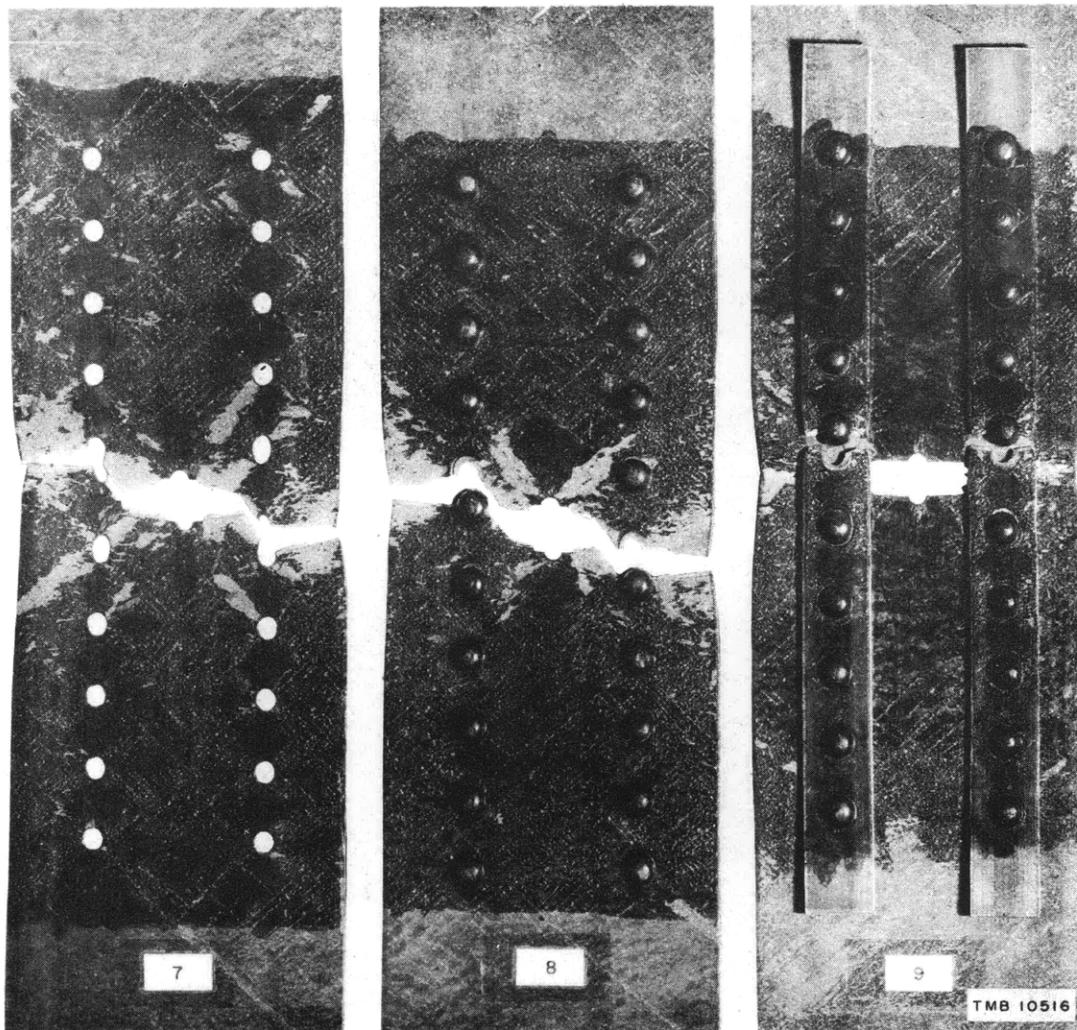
Specimens 7, 8, and 9 with Holes Open, Filled, and Strapped
